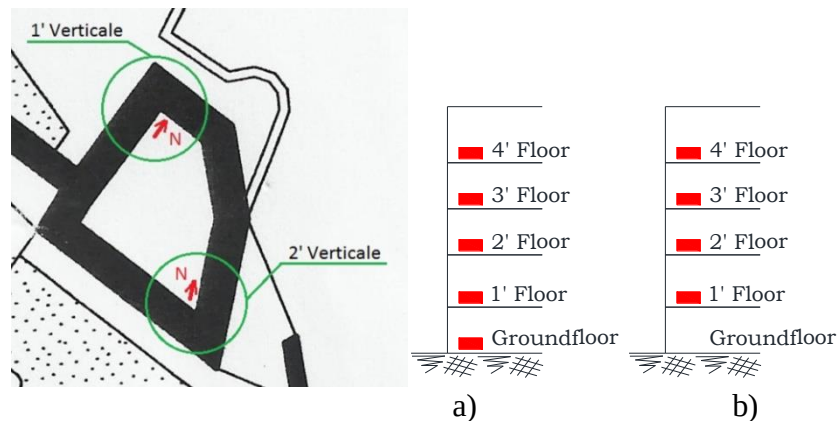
Measurements position in plan and in elevation in 'Guaita' Tower: a) first vertical, b) second vertical
